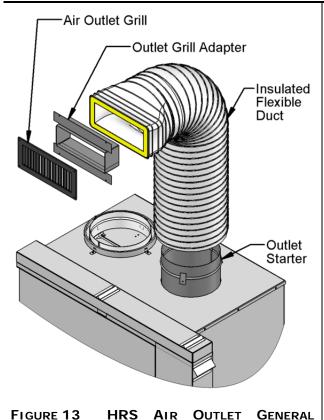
HRS AIR OUTLET GENERAL INSTALLATION
